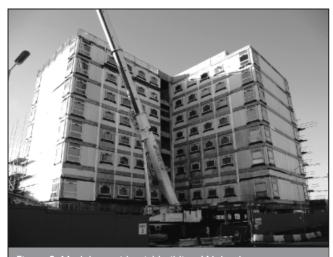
Modular residential building, Wolverhampton (courtesy Vision Modular Structures)
